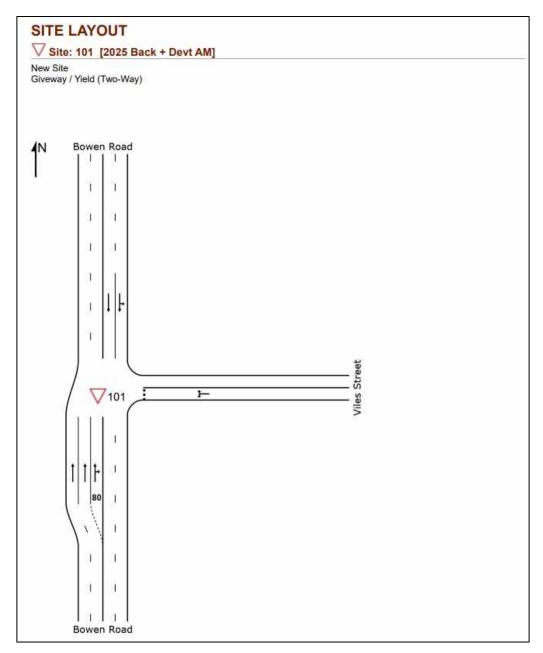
Post development Bowen Road/Viles Street Intersection Layout
